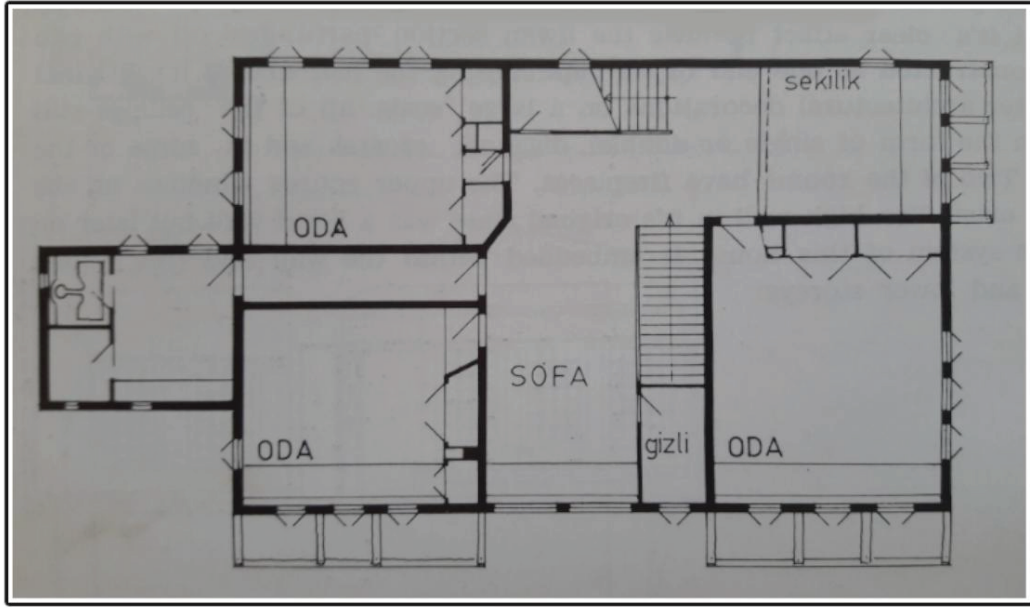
First floor plan of Izmit Fazıl Pasha Mansion.(Source: Eldem 1984, p.154)
